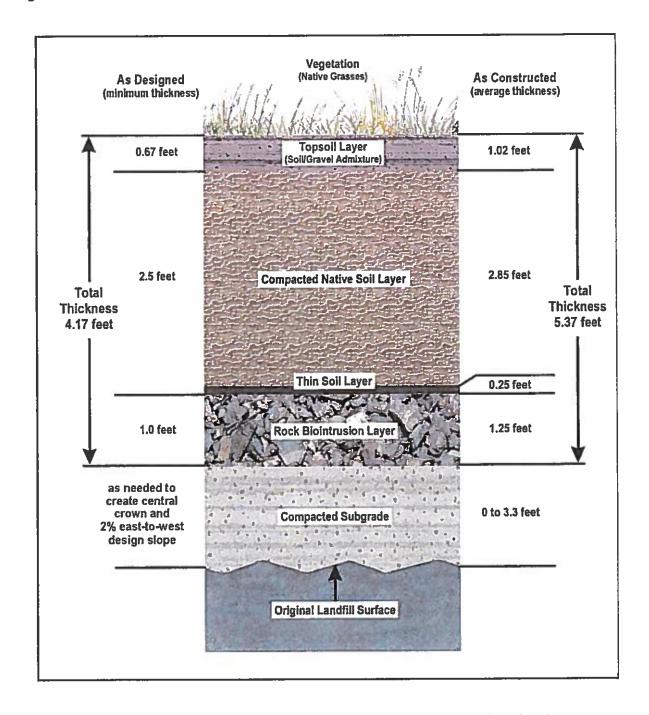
Schematic profile of Mixed Waste Landfill cover system, as designed and as constructed.
